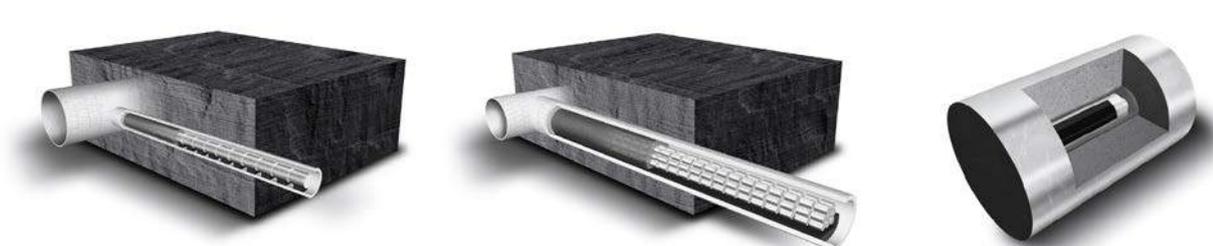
General layout of the HLW (left) and LILW (right) waste sections, and the OPERA Supercontainer
